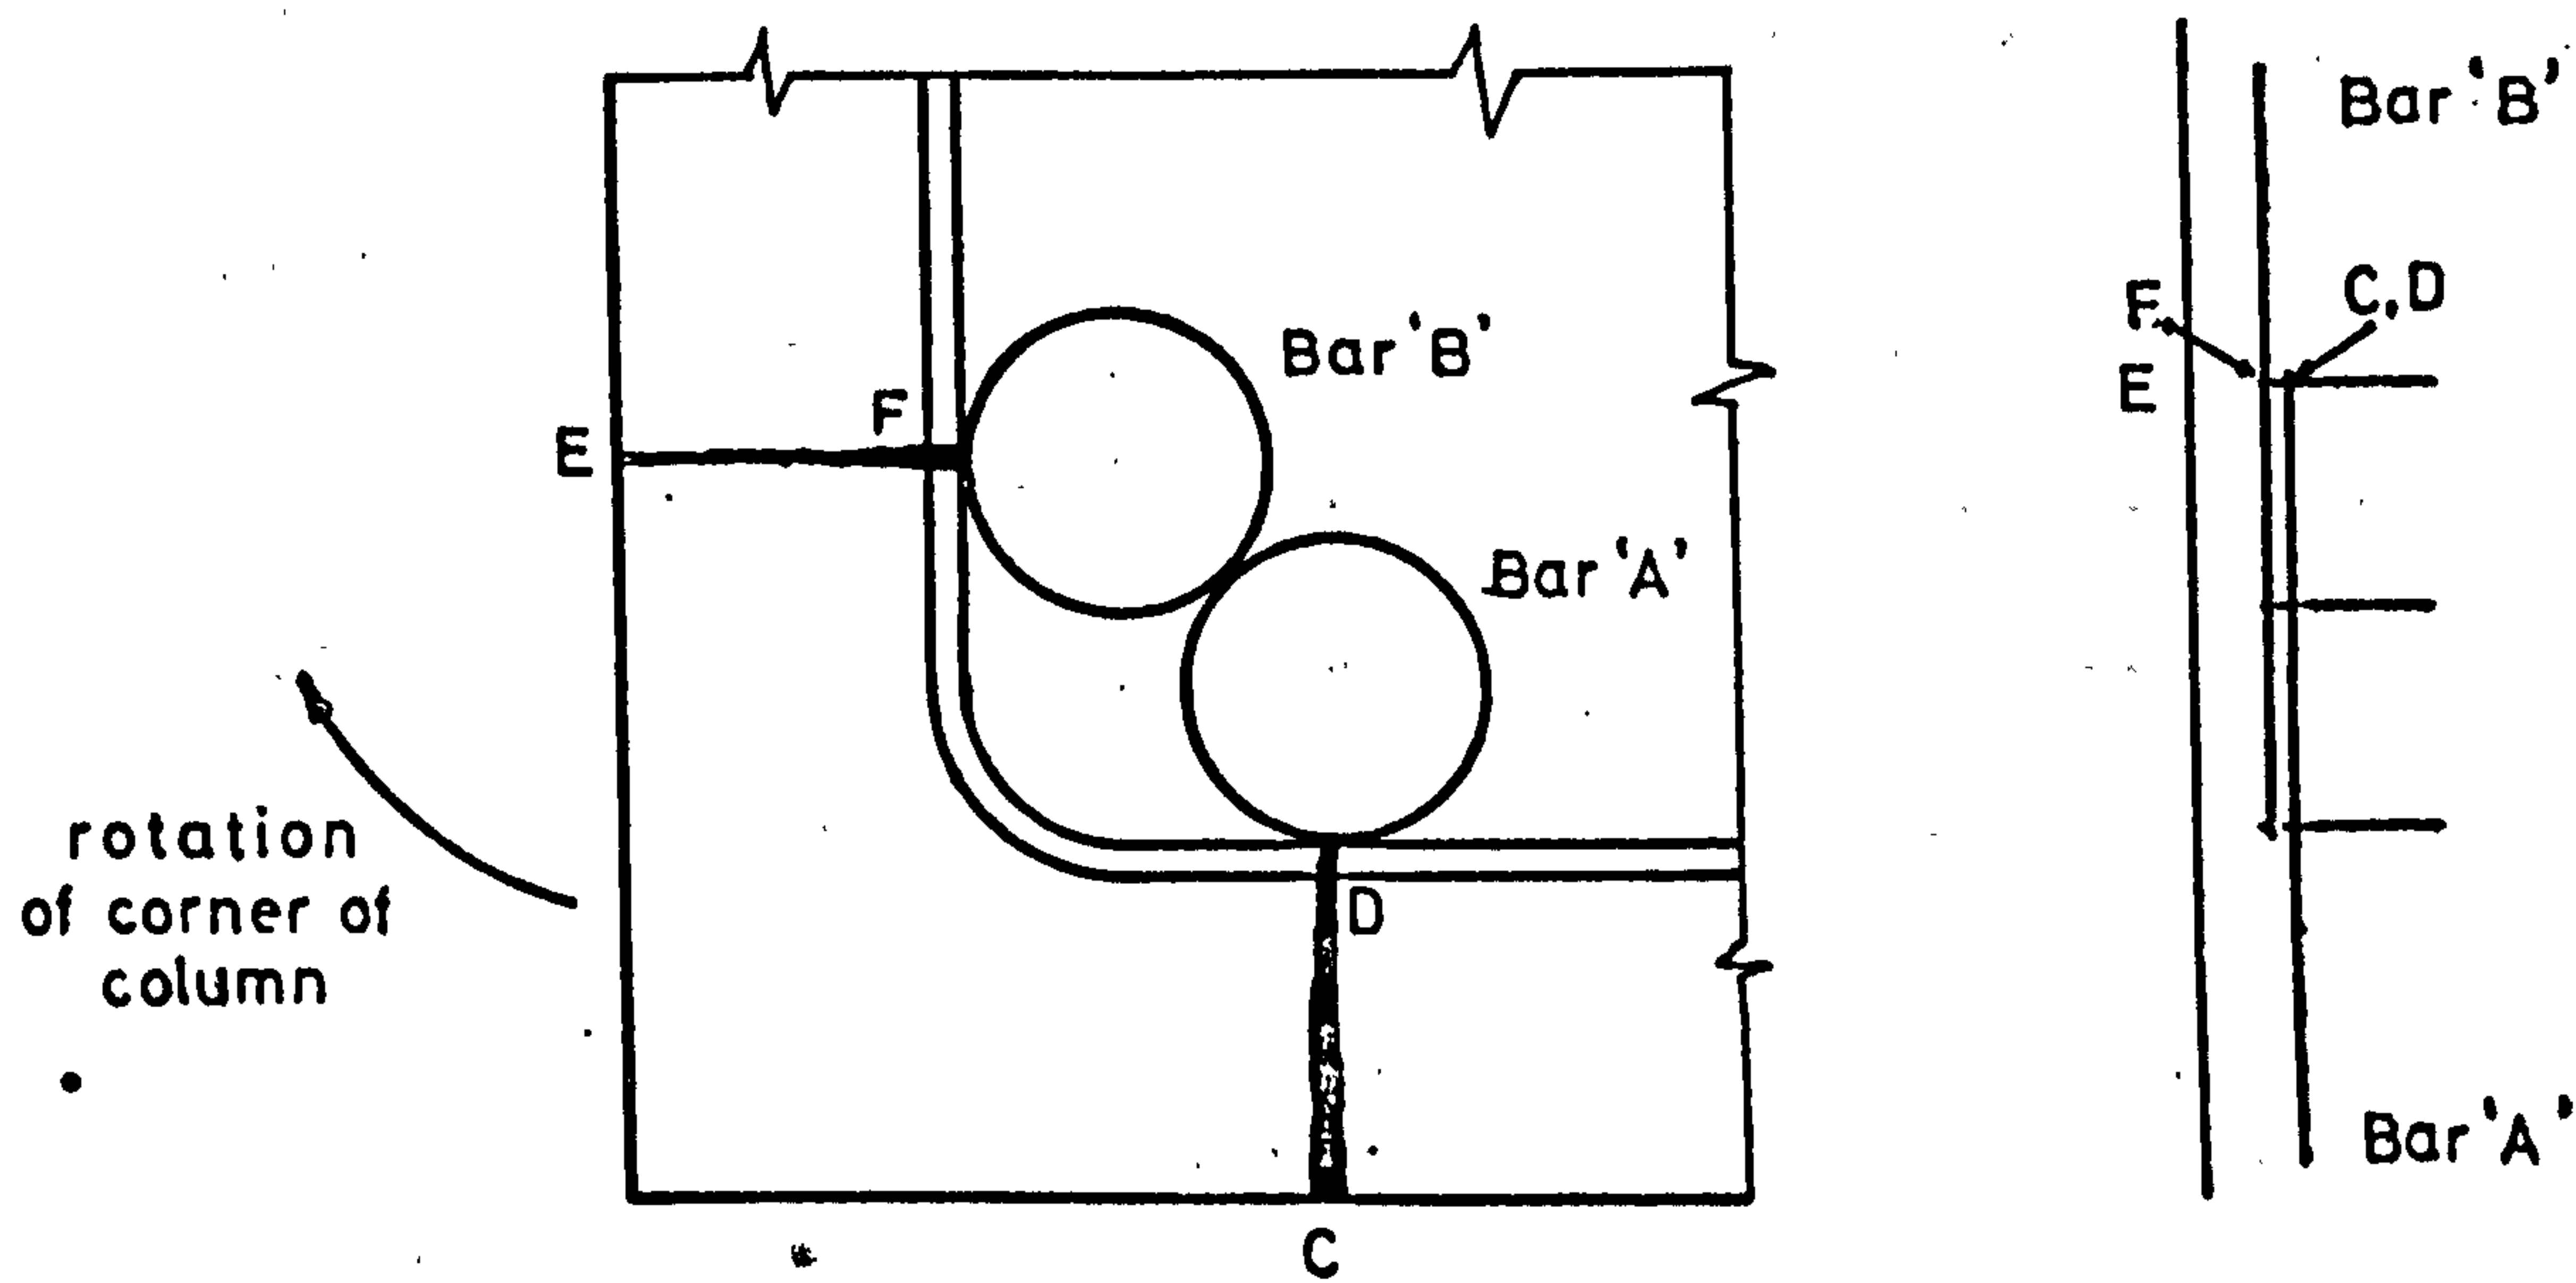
Development of longitudinal cracks around reinforcement.
